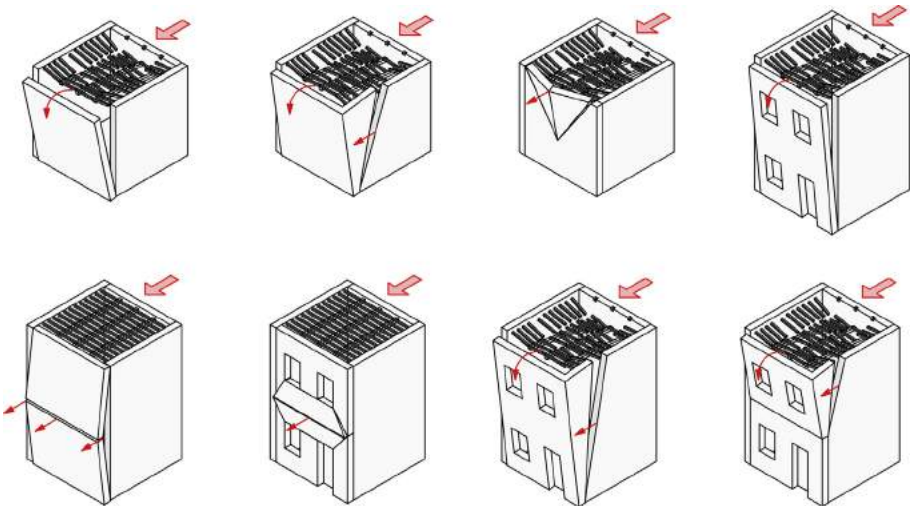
Collapse mechanisms of masonry walls subjected to horizontally thrust. Drawings: D. Omar Sidik.
